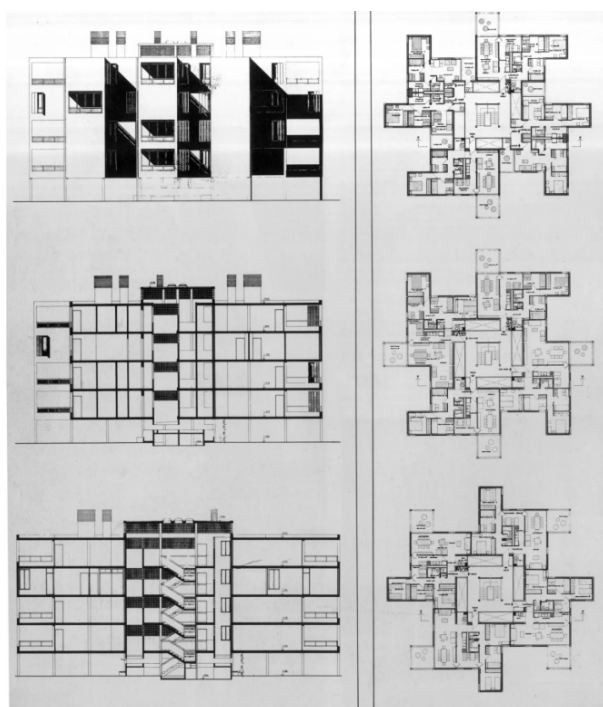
| Elevations and plans of Las Fronteras social housing, Torrejón de Ardoz, Madrid. Source: Modulo Hele de Rafael Leoz.
